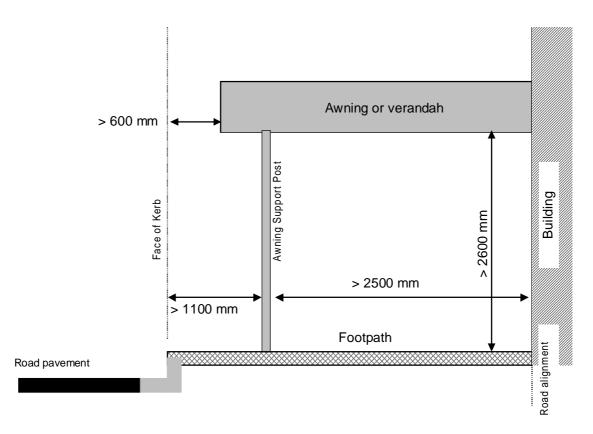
Typical elevation view of development standards for awnings or verandahs supported by posts over public roads.
